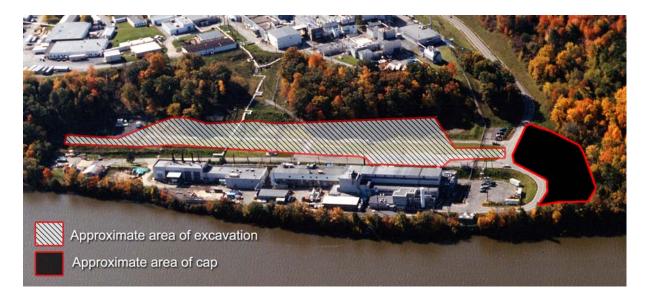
Assumed Areas of Excavation and Cap for Alternative LL-3
